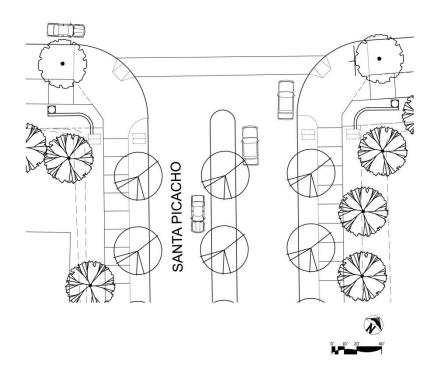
Primary Village Entry Concept Plan (Heritage Road @ Santa Picacho)
